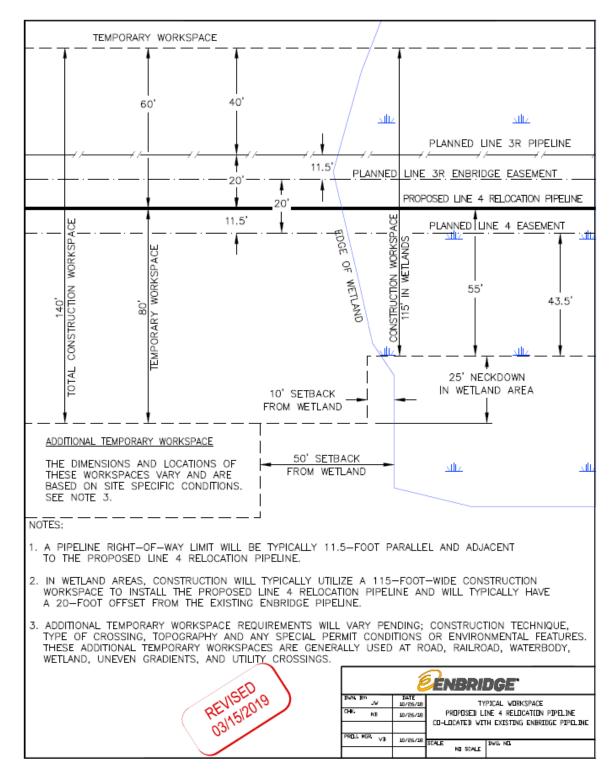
Option 5 Typical Construction Workspace Fond du Lac Band Reservation
